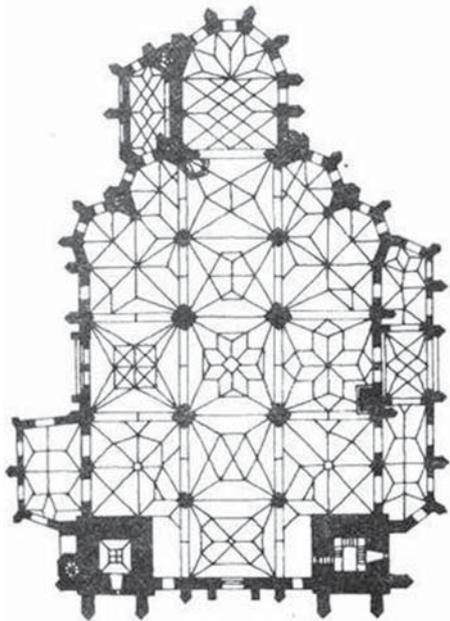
St. Elizabeth in Kosice - floor plan of the temple. Condition before reconstruction of purist architect I. Steindl and beyond (source: E.Králová: Restoration and Conservation, ES STU Bratislava 1982)
